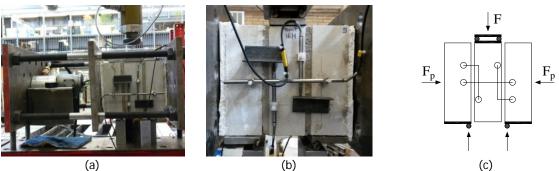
Test set-up for shear-compression test on masonry specimen.
